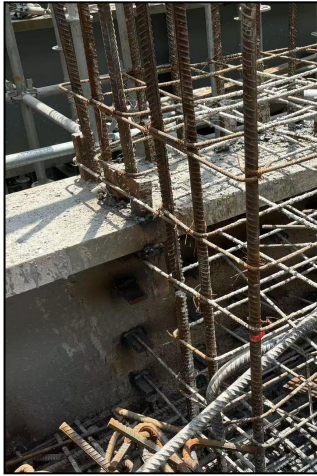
Longitudinal Reinforcement Connection at the Bottom of the Frame Column
